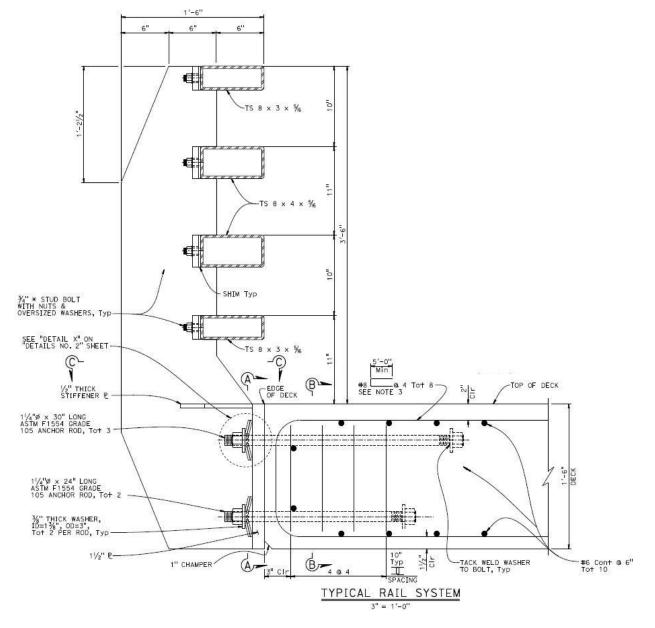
California ST-70, Side-Mounted, Bridge Rail [20]
